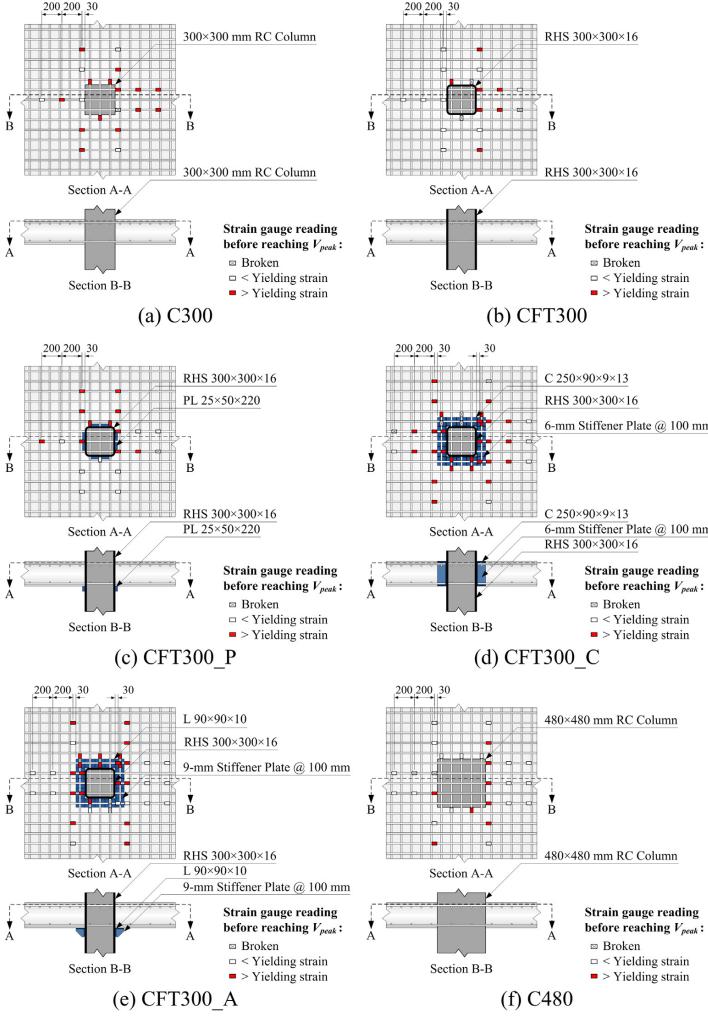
Slab-column connection detail([Chen et al., 2020](#)).
